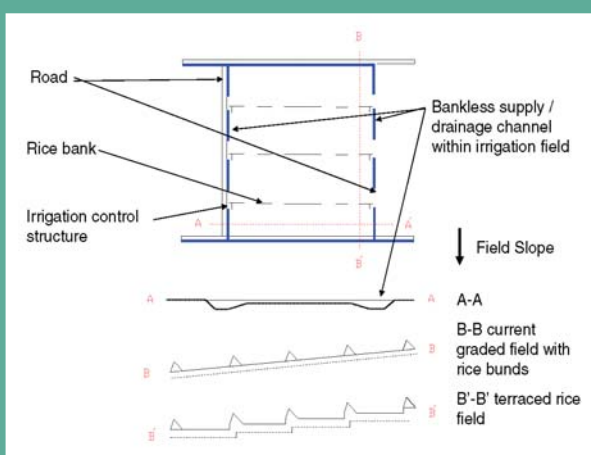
Plan and cross section views of a bankless channel with graded and terraced layout
